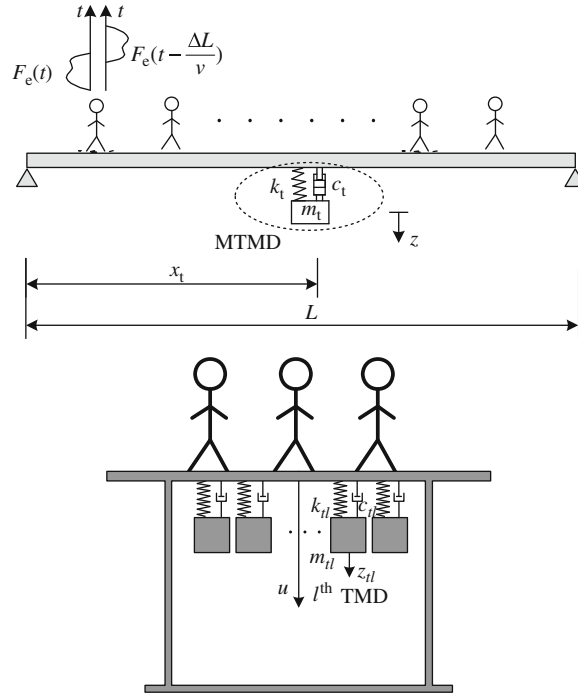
Footbridge installed with multiple tuned mass damper system under crowd walking.
